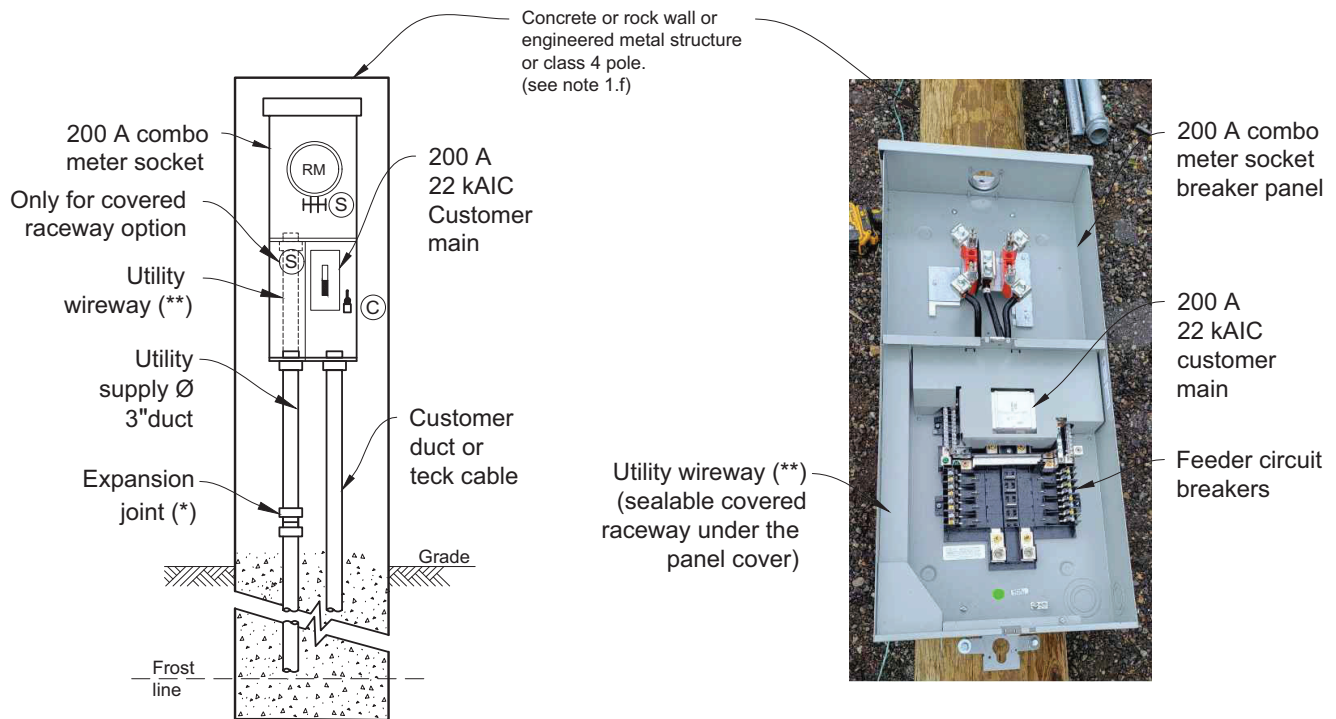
200 A hot-style combo meter socket with breaker panel
